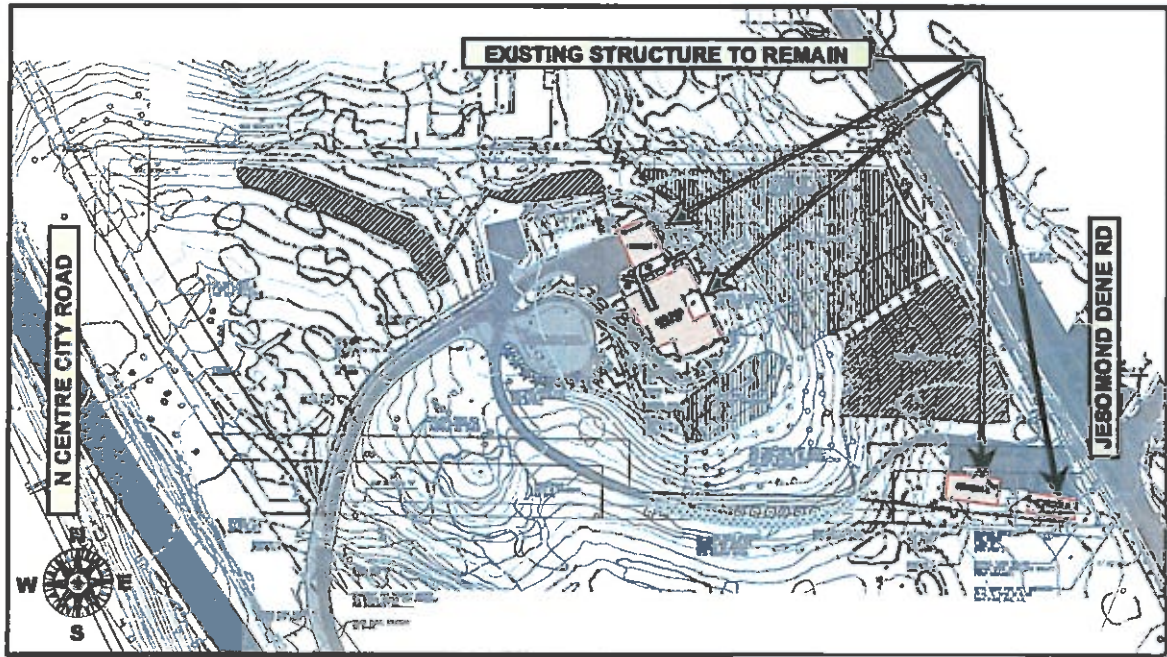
Rancho Verona Site Plan (Masson & Associates, INC, 1/05)
